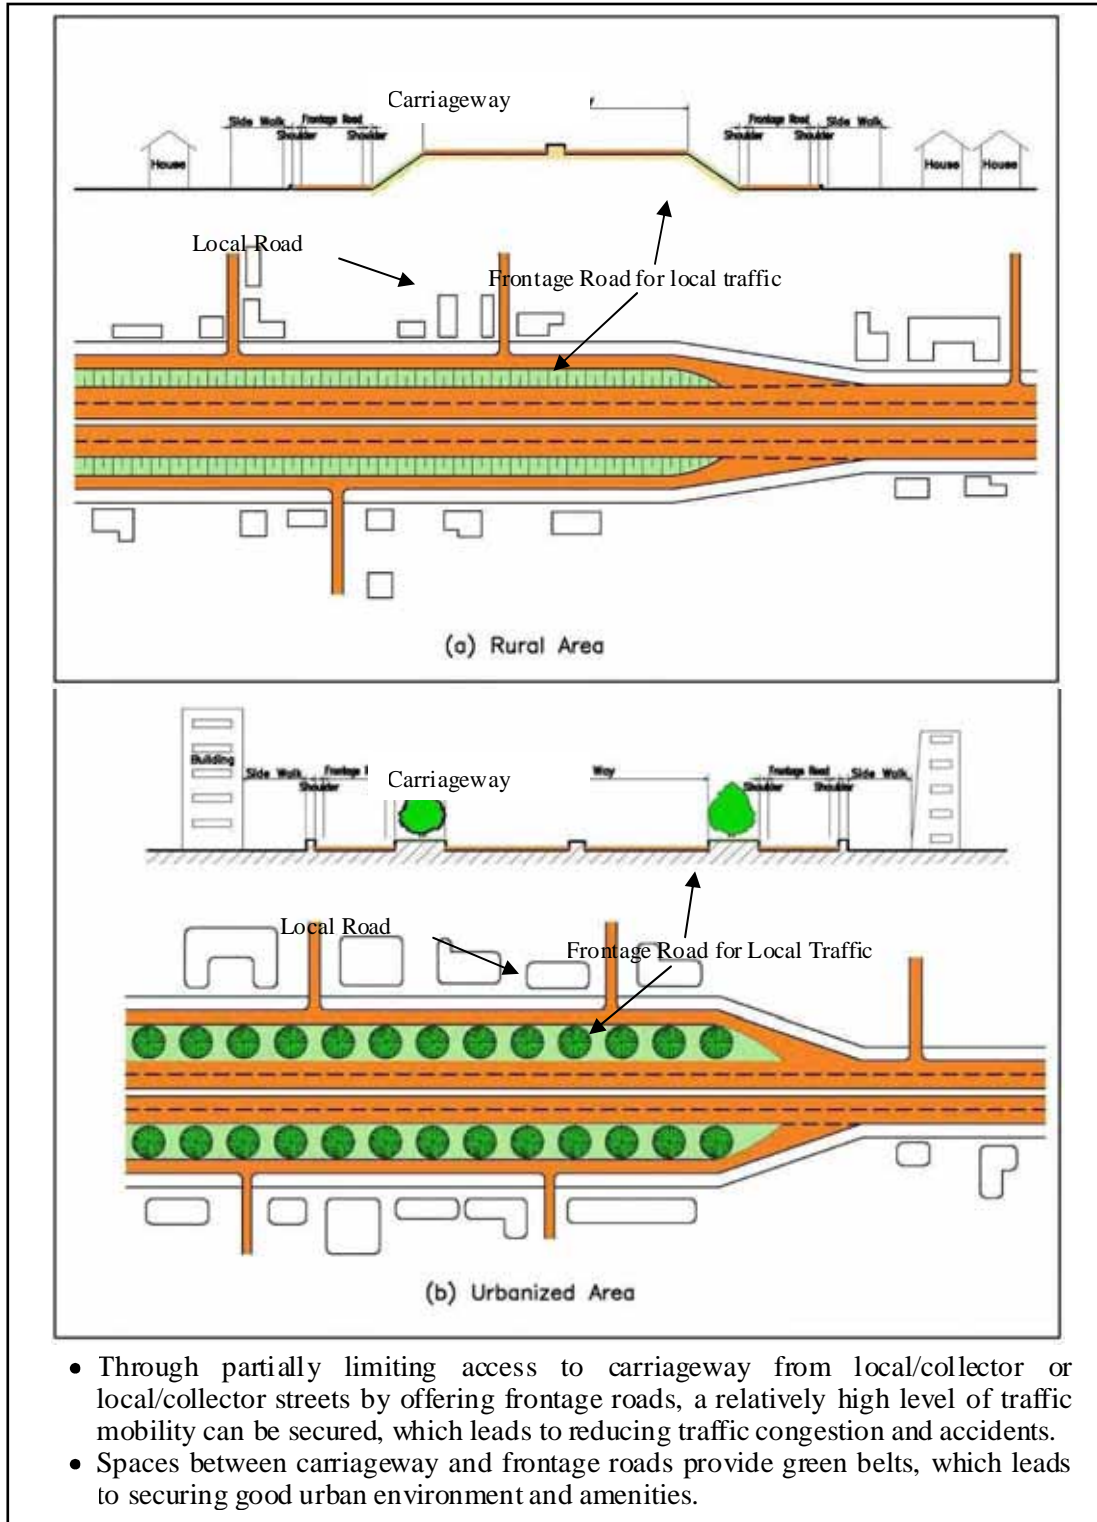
Principal Arterial Street with Frontage Roads
